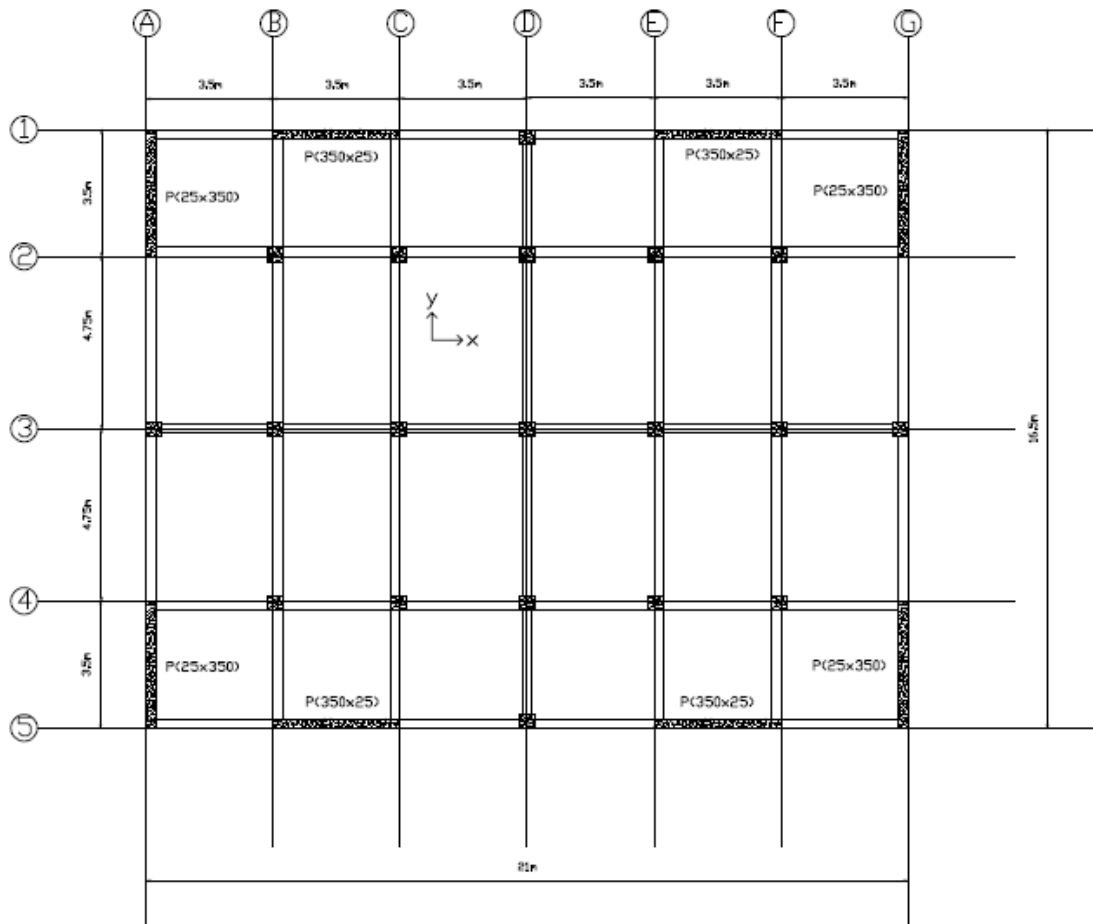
Plan of Model 3 with 1.0% Wall Area to Floor Area Ratio in Each Direction
